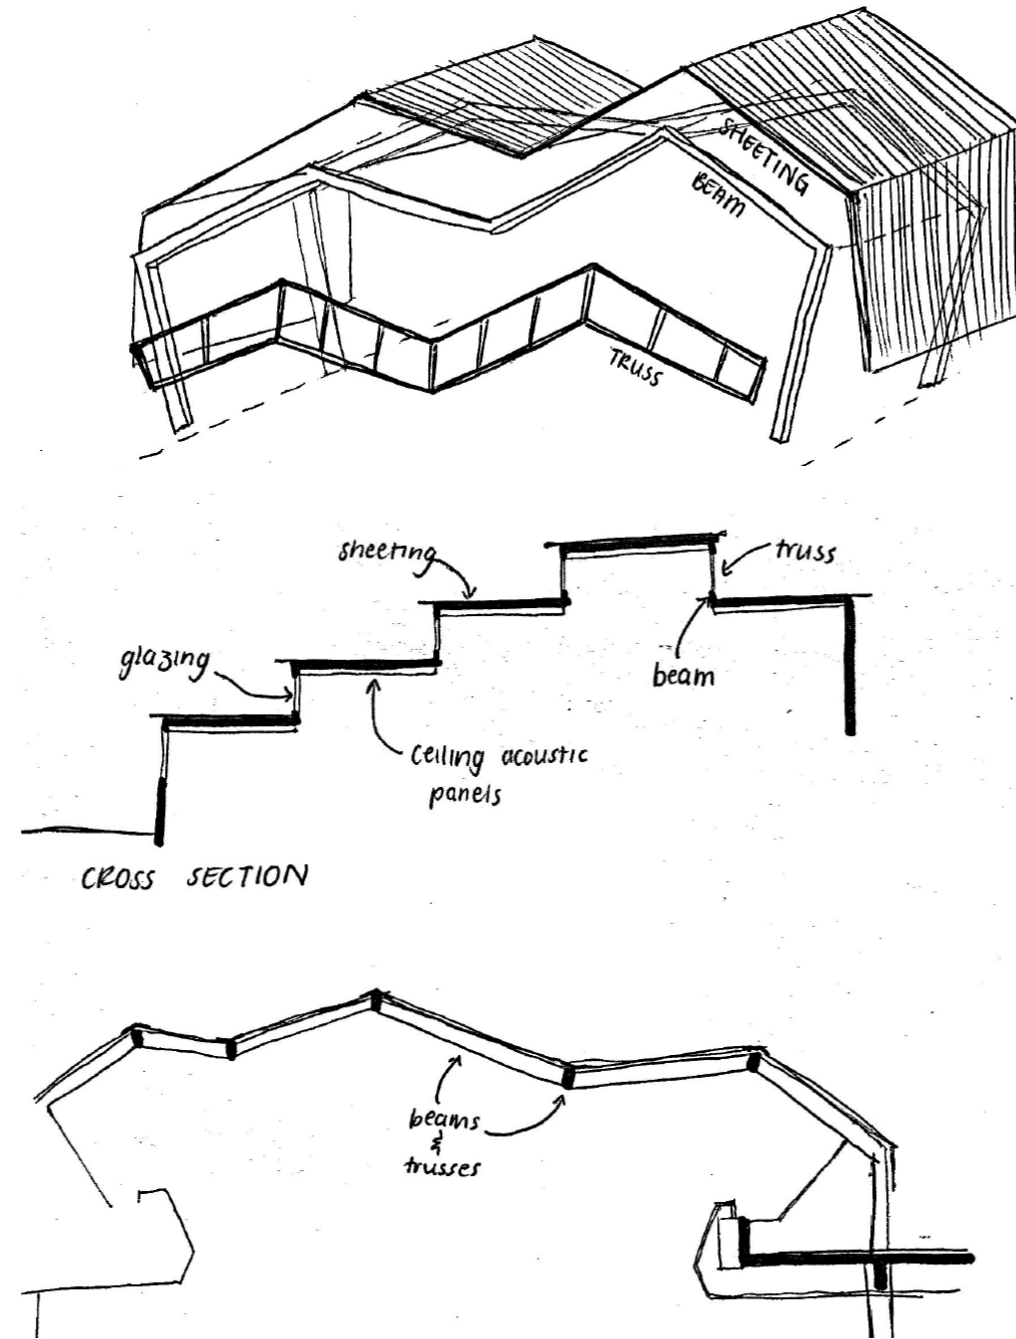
Trying to understand the structure of the roof (Author 2020)
